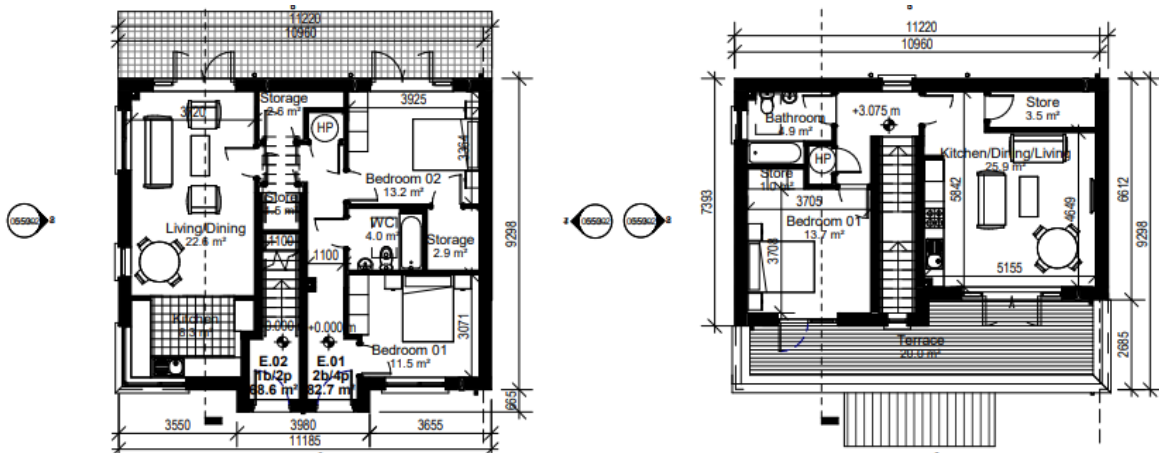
Proposed ground (left) and first (right) floor plan of Duplex Block B
